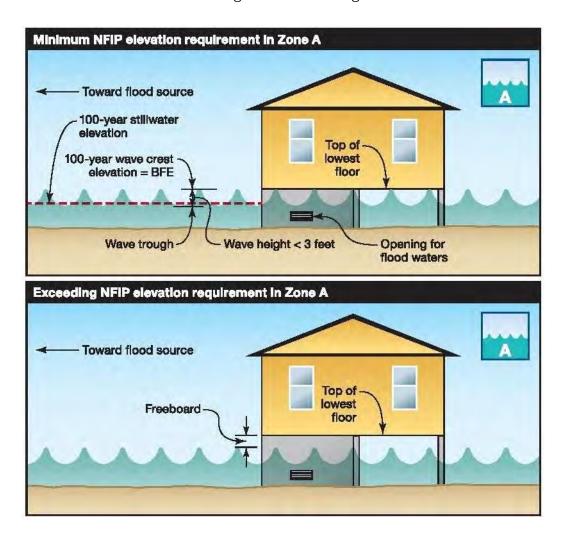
Recommended Elevation for Buildings in Zone A Compared to Minimum Requirements Source: FEMA Coastal Construction Manual, 2011
